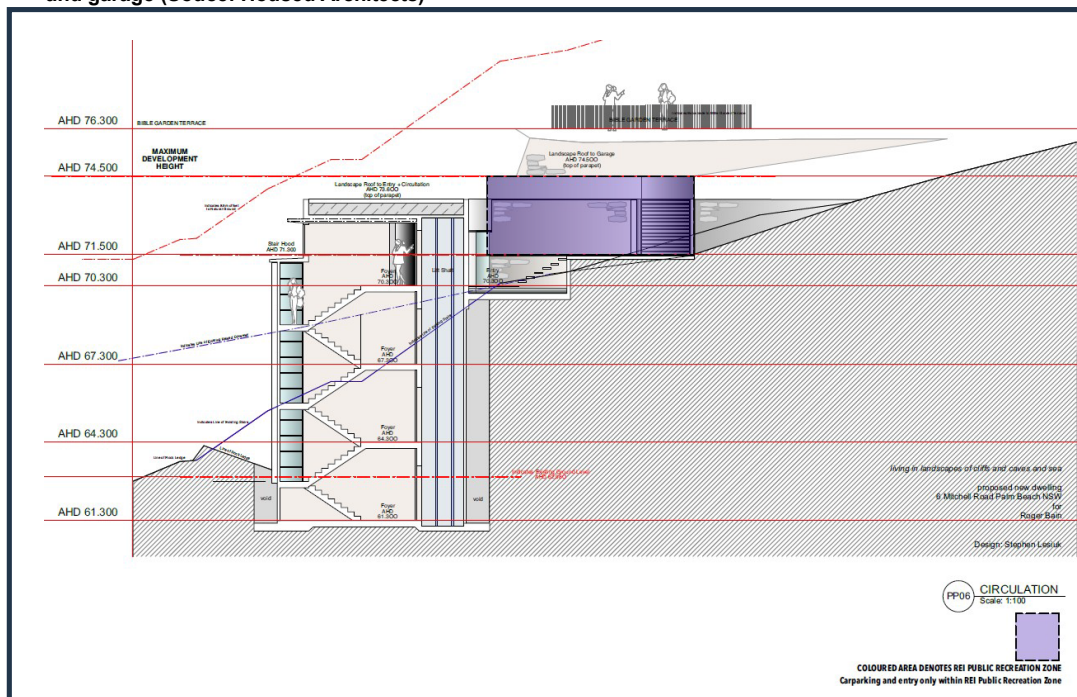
Concept Circulation Plan detailing the garage as below the Bible Garden and height limit (Source: Housed Architects)
